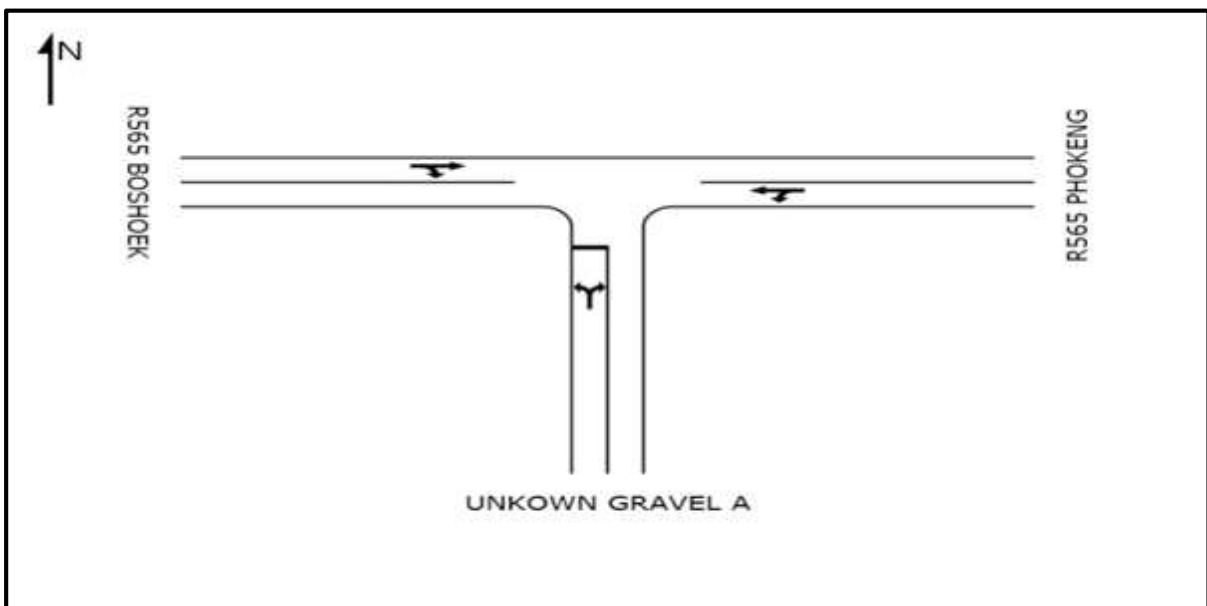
R565 & Unknown Gravel Rd intersection C Layout
